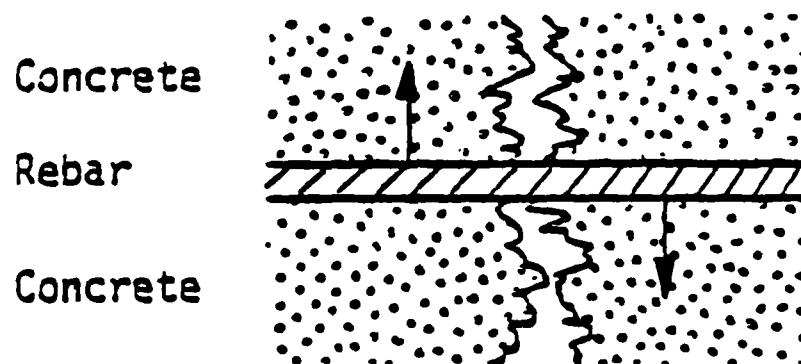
Dowel action - the transfer of shear load across a concrete crack by a rebar.
